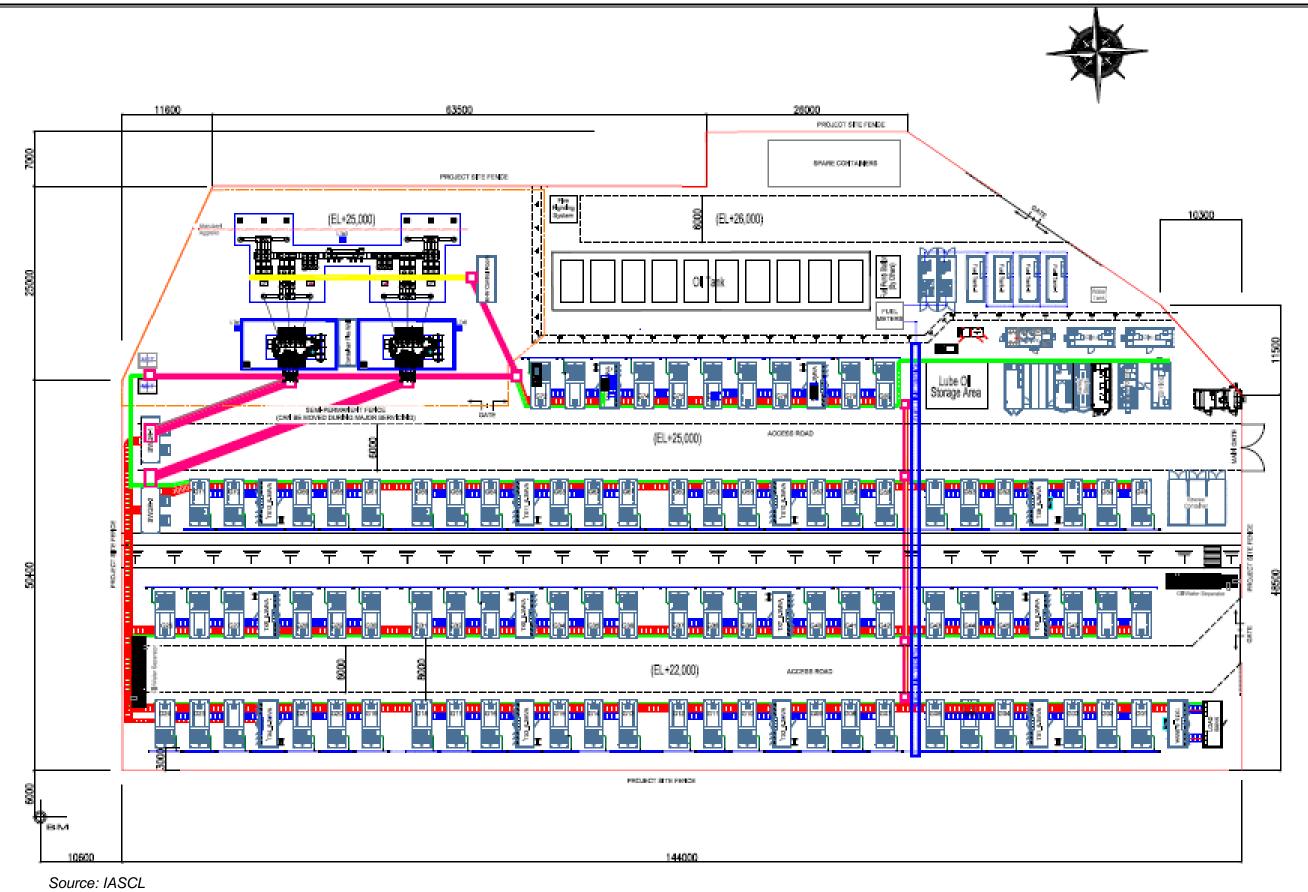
Layout and Site Development Plan of the Proposed Modular Diesel Power Plant Ancillary Project
